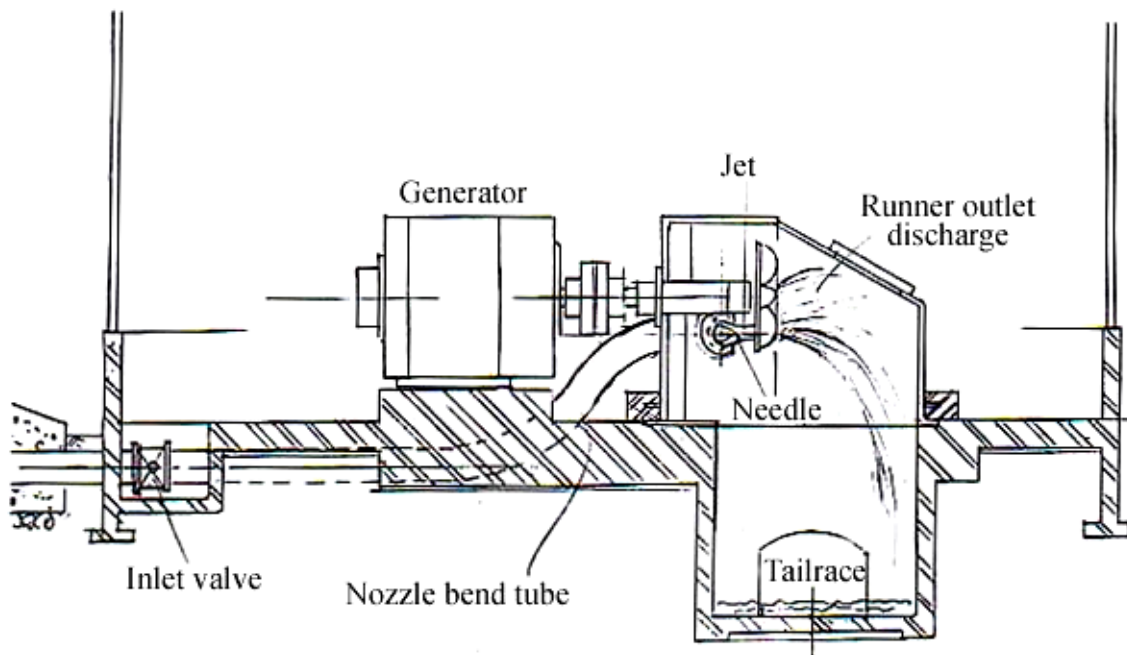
Inner Shape of Turgo Impulse Turbine
